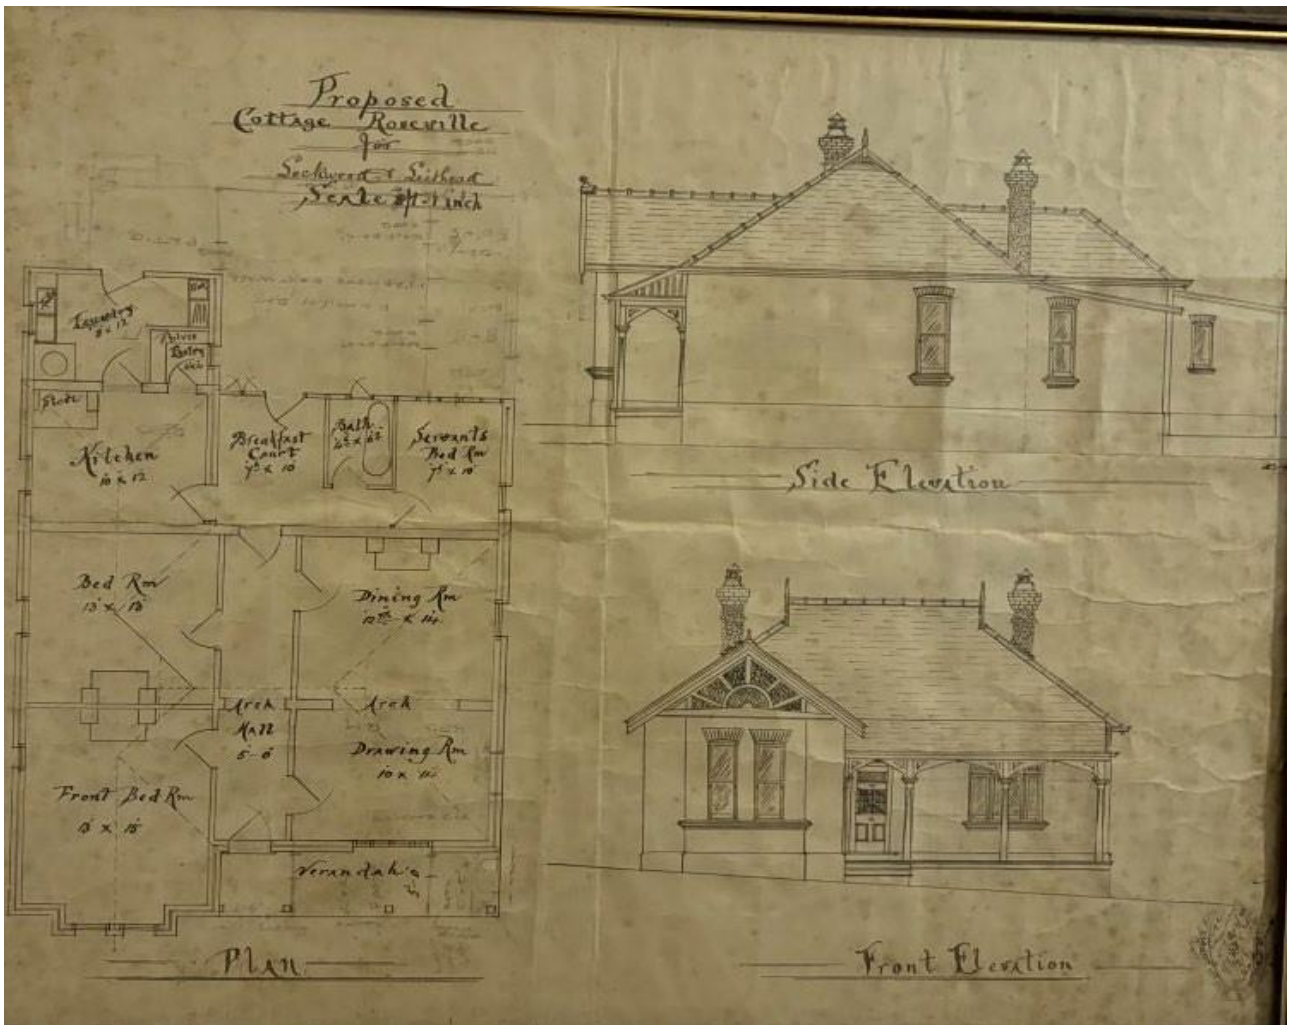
Original Elevations and Plans produced for Lockwood and Leithead circa. 1906.
